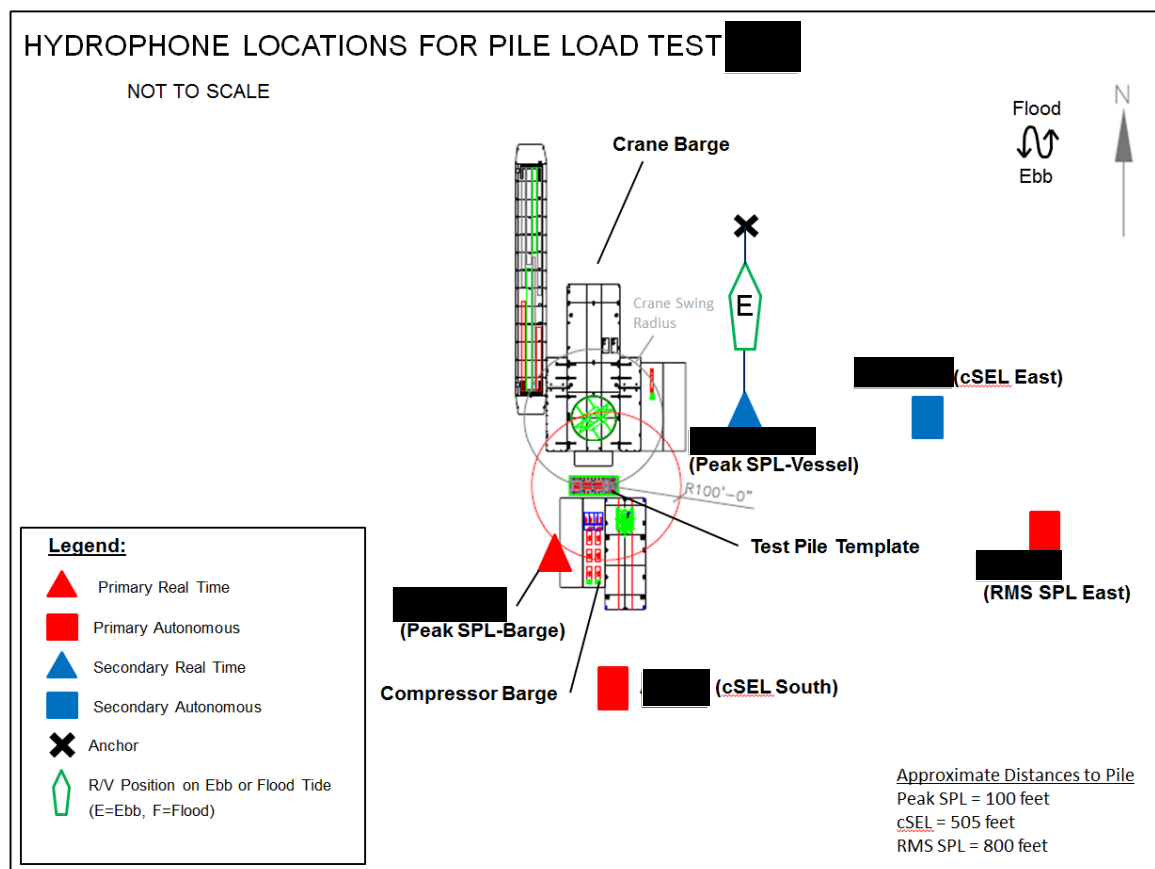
Plan view of pile and barge layout, 31 July 2013, PLT- [REDACTED]
